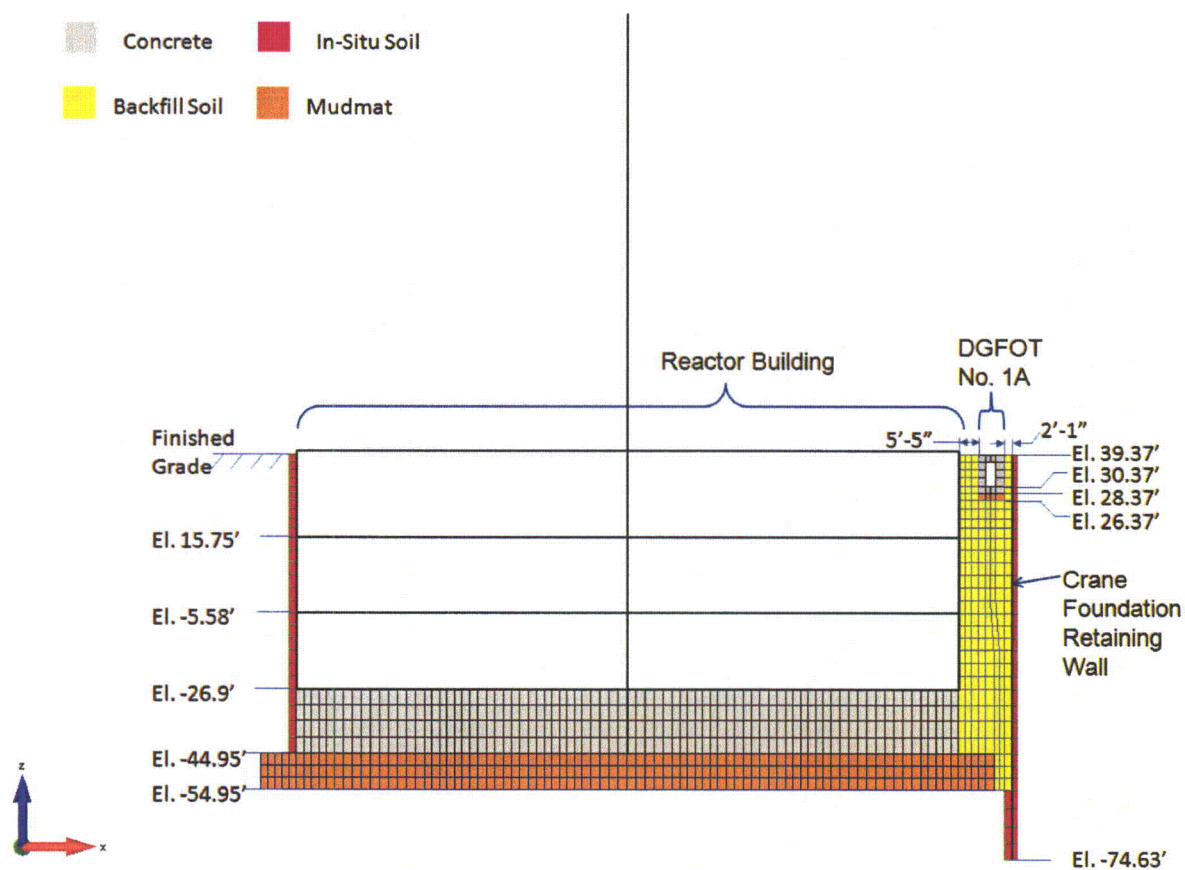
H.7-21: 2D SSSI Model of RB, DGFOT and Crane Foundation Retaining Wall
